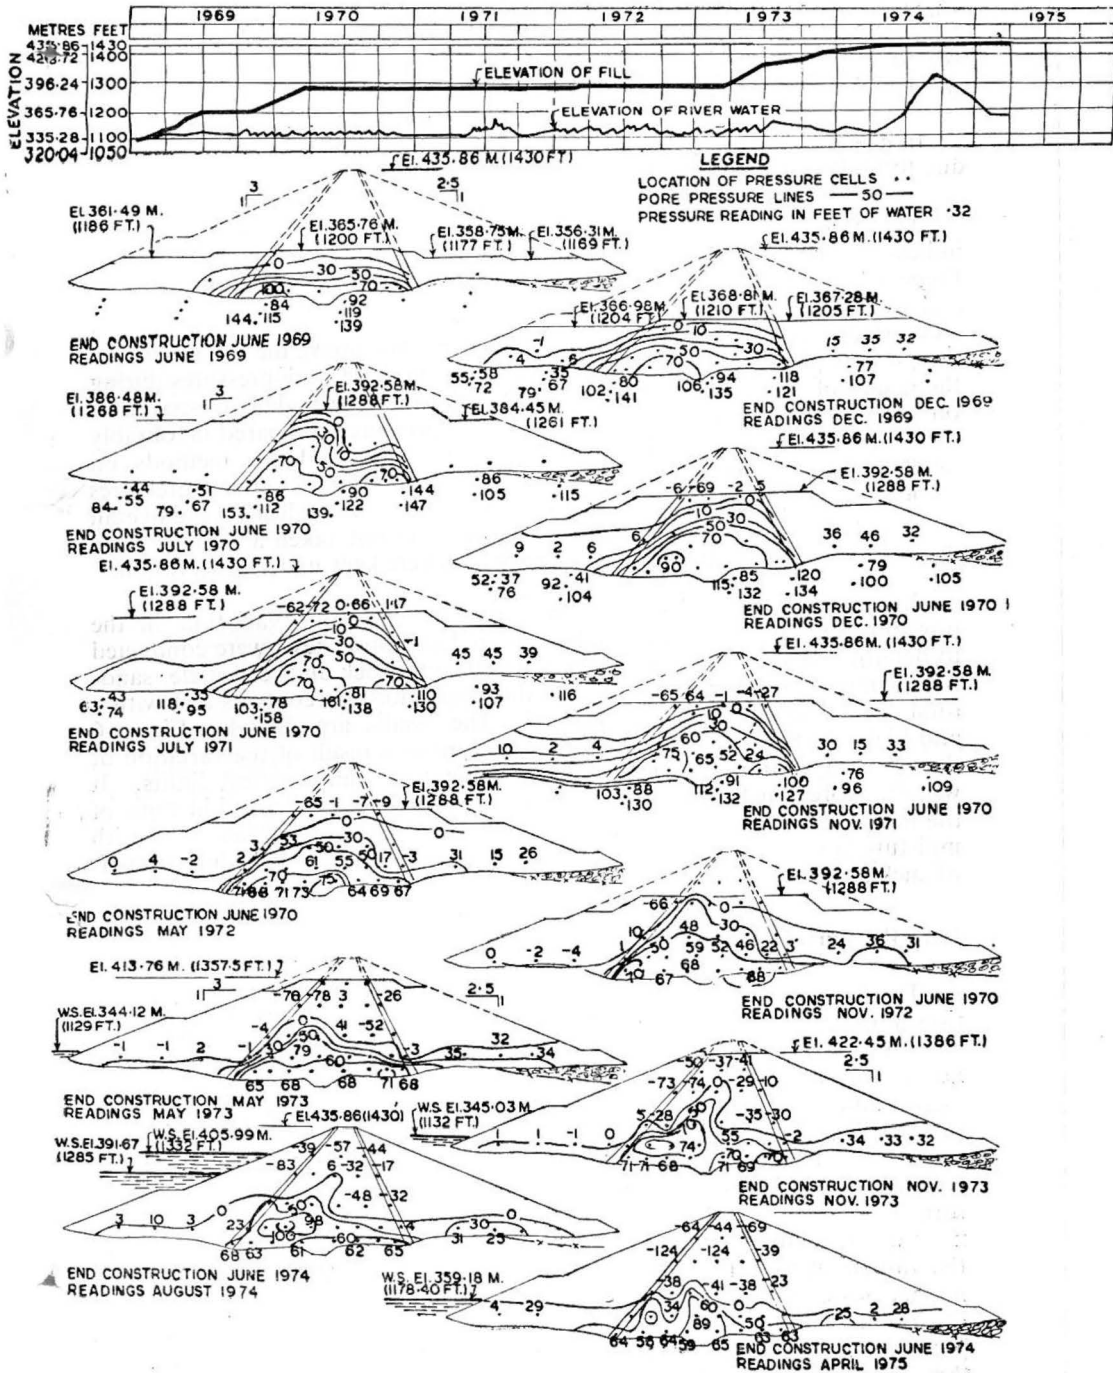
(Contd.) Construction Pore Pressure Diagrams for section at station 22+55.52 m
